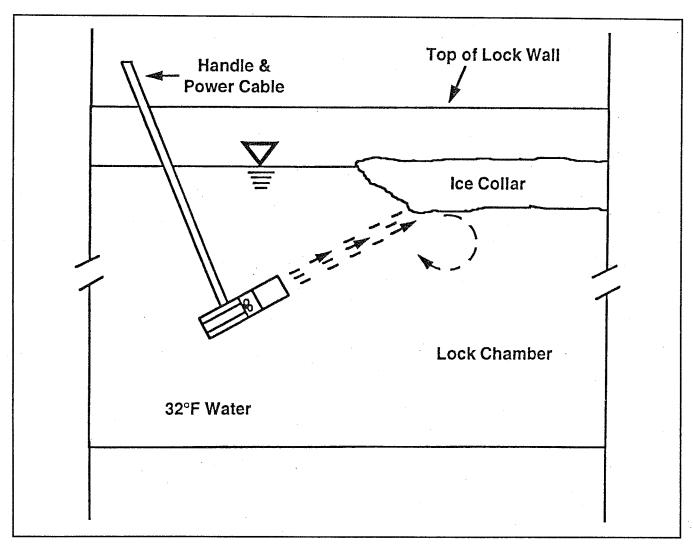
Sketch of the system in a field application melting an ice collar on a lock wall
